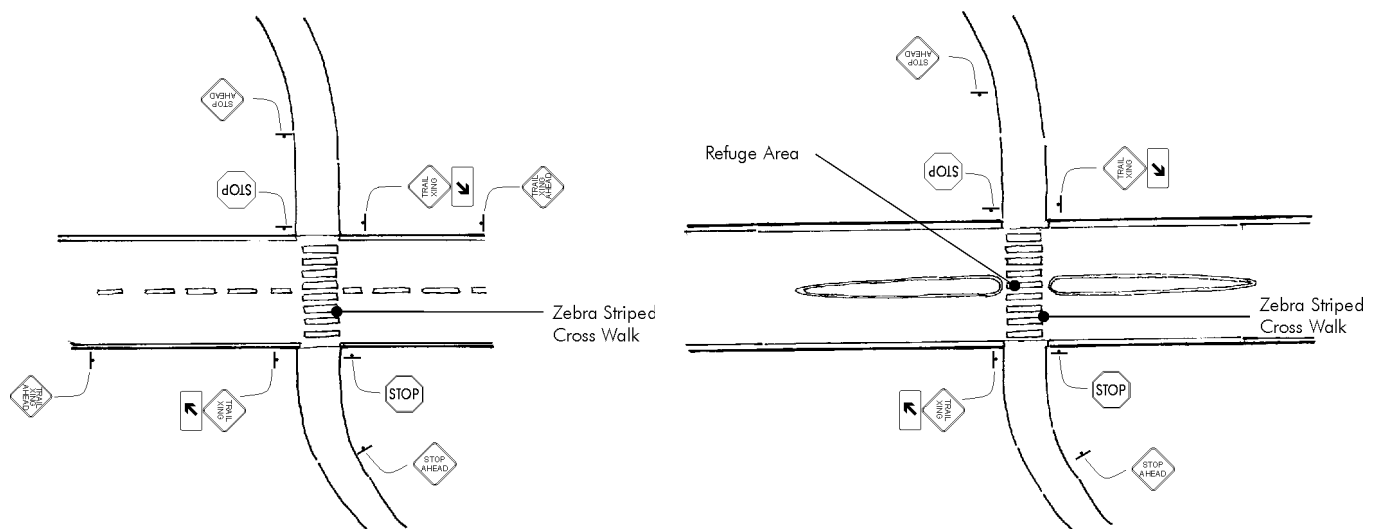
CROSSING LAYOUT FOR ARTERIAL ROADS
